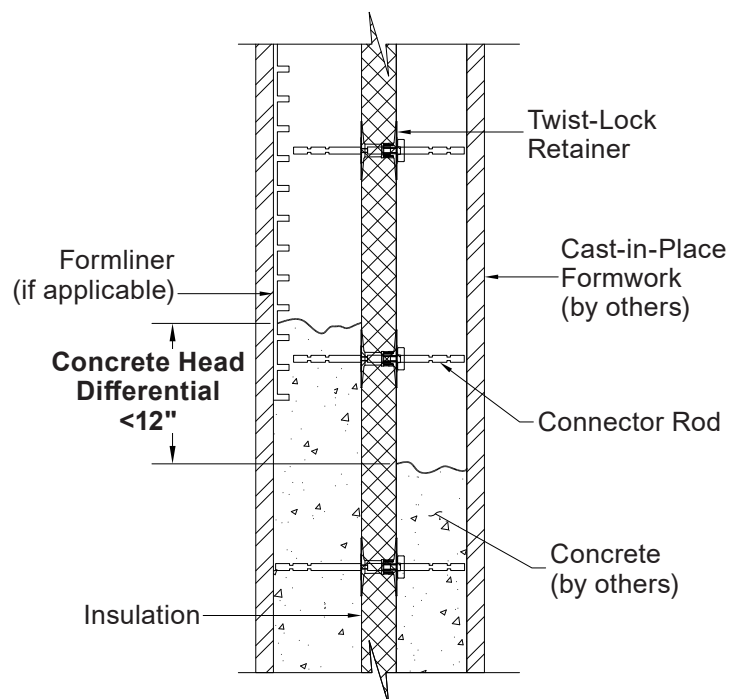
Cast-in-place twist-lock connector as placed within wall assembly.
